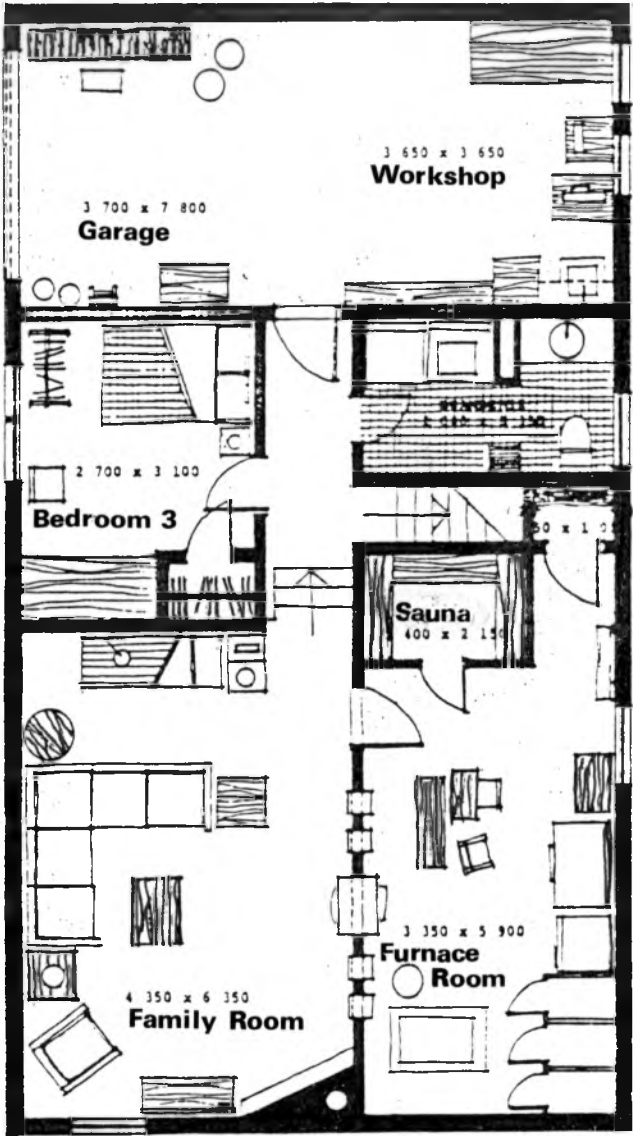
Basement plan of the triplex occupied by Household 12 in which a "sitting room" and a bedroom were installed (Other 1). The exaggerated depth of these two rooms was dictated by the presence of two rows of columns along the length of the dwelling (1270). Scale: 1/100.
